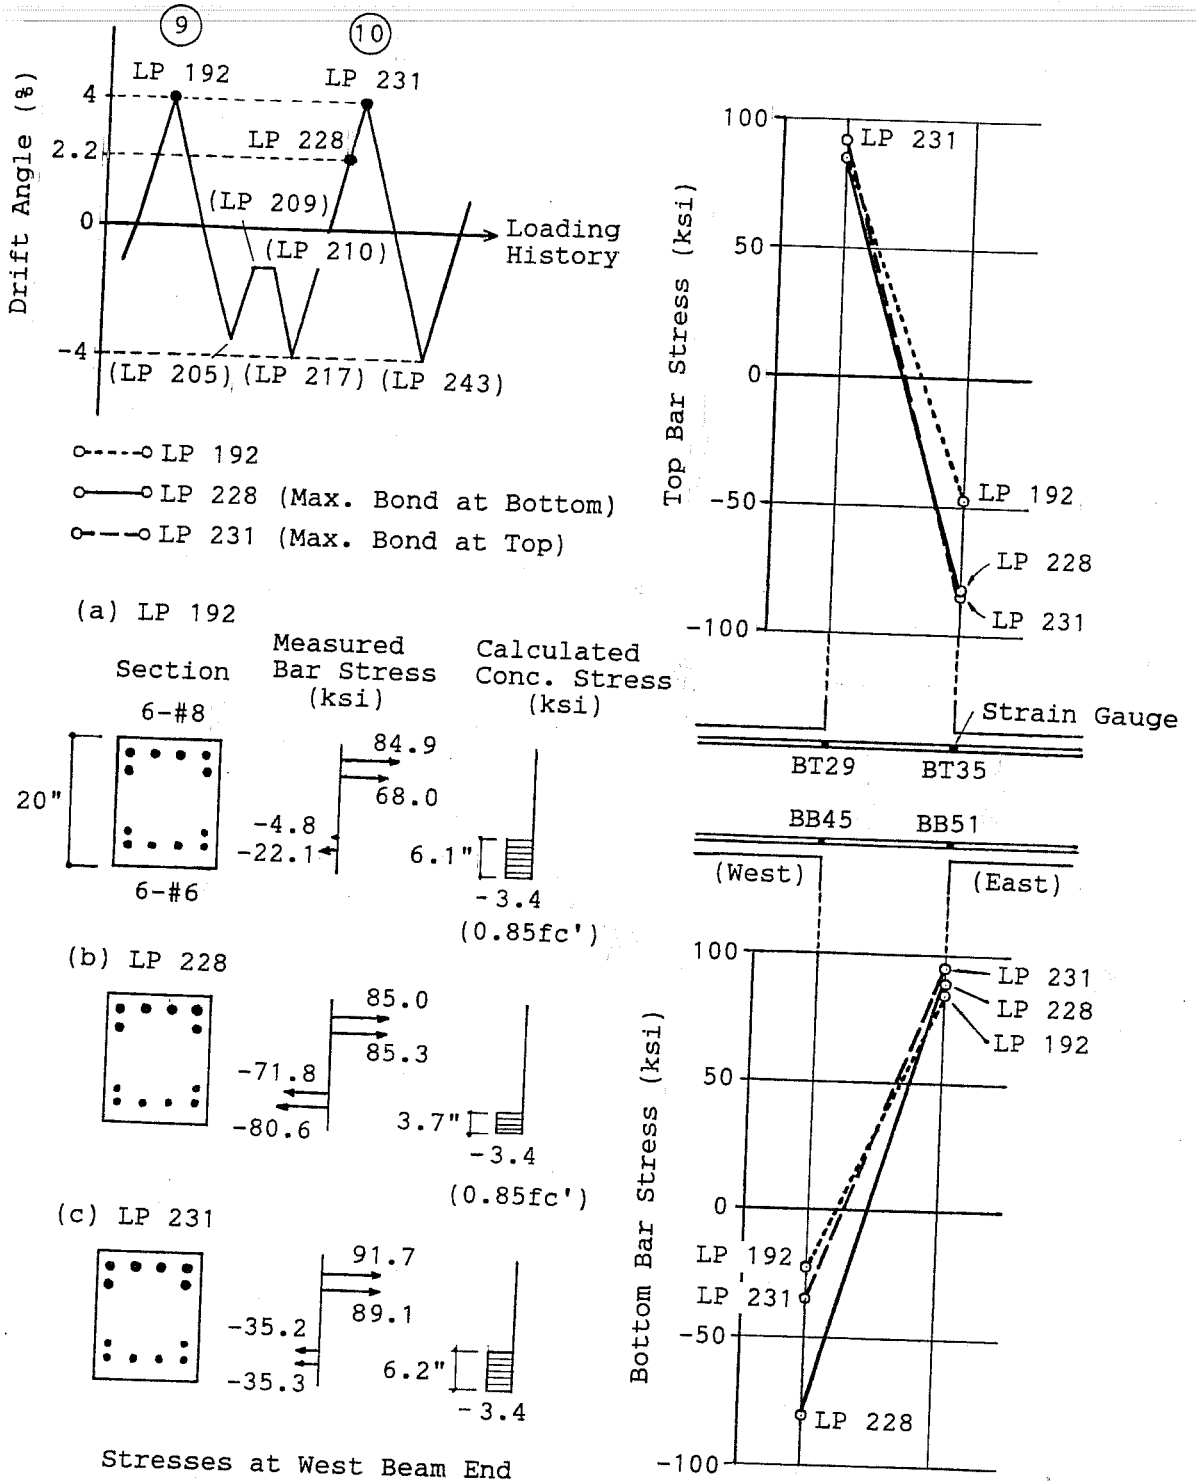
Beam Bar Stresses at Maximum Bond Within Joint in 4% Drift Unidirectional Loading (Specimen J2)
